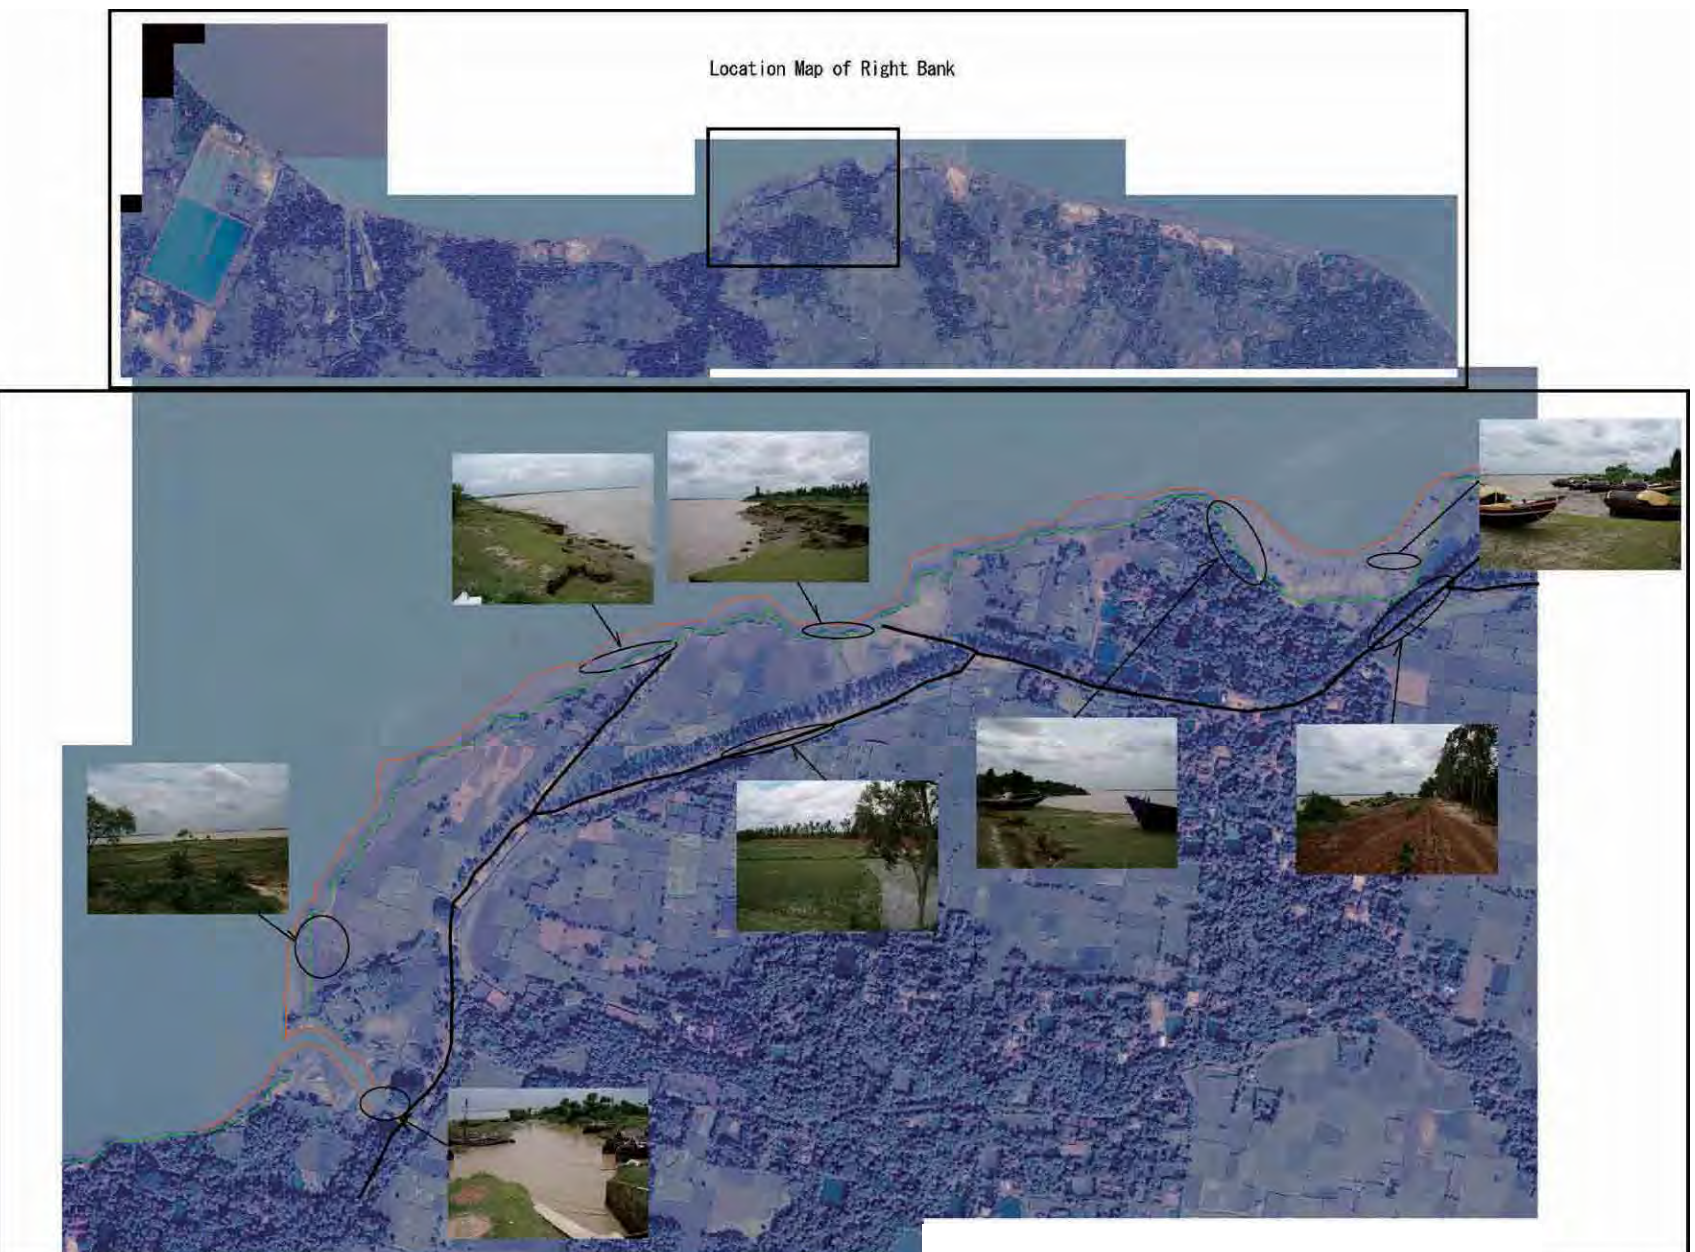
River Bank Protection Works at Right Bank (2/5)
